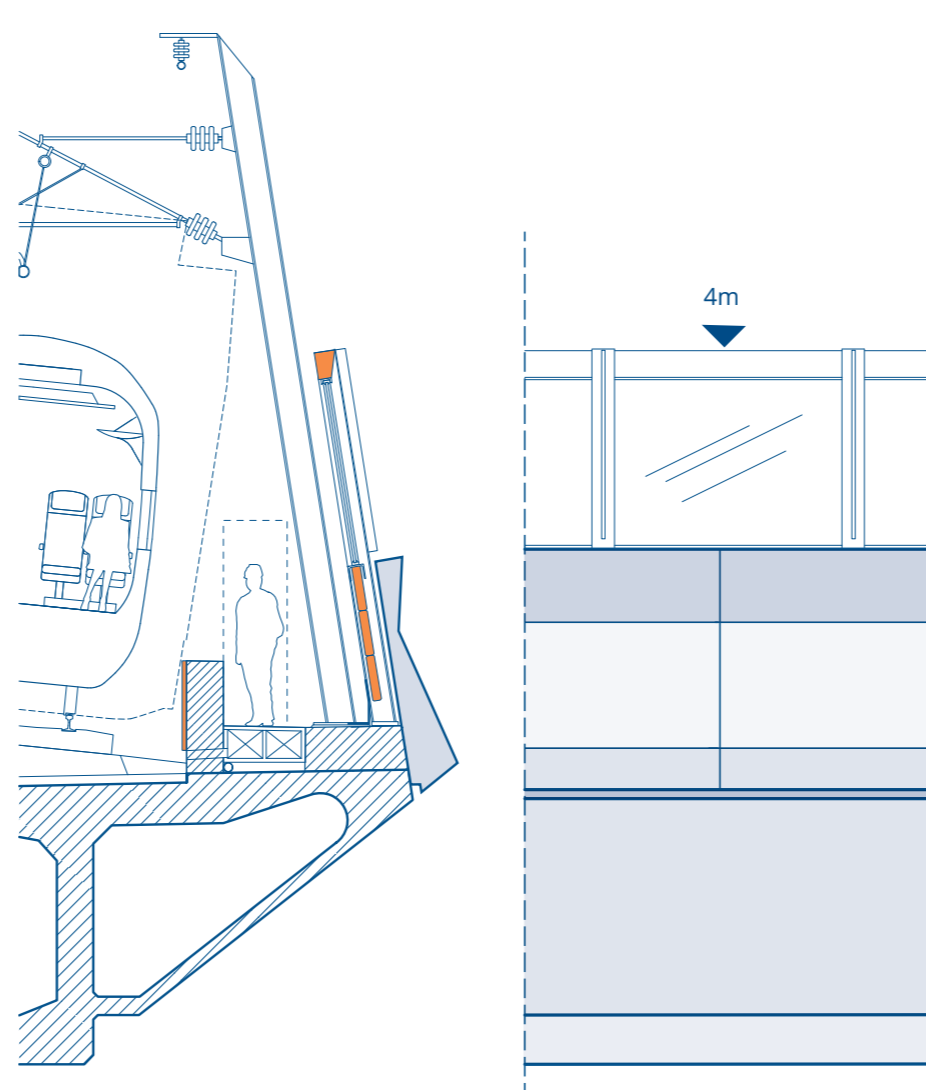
\_ Section and elevation - 4m hybrid barrier
